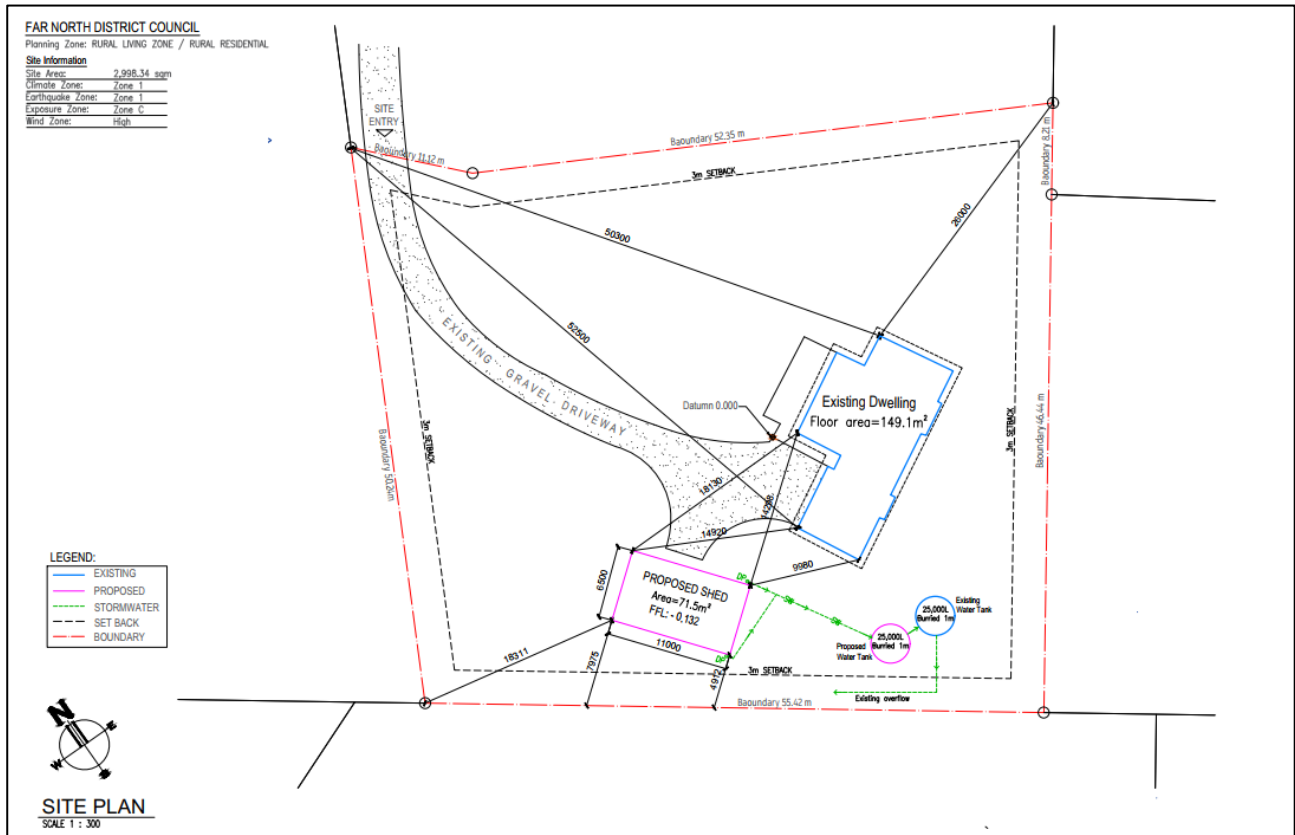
Snip of Proposed Site Plan by Waikato Shed Company (Ref No: 310735K, dated: 26.09.2023)
